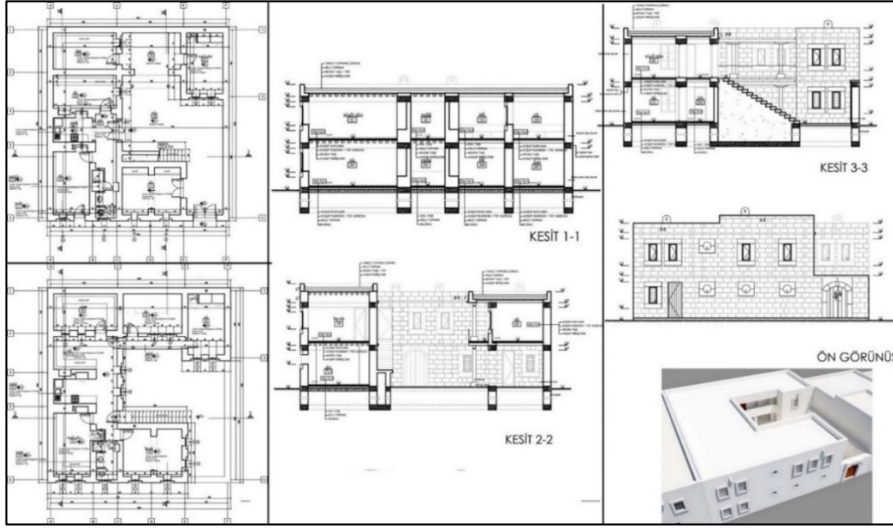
Local texture and architectural features in rural area project type 4C floor plans sections and views (Çorapçıoğlu et al., 2008e).
